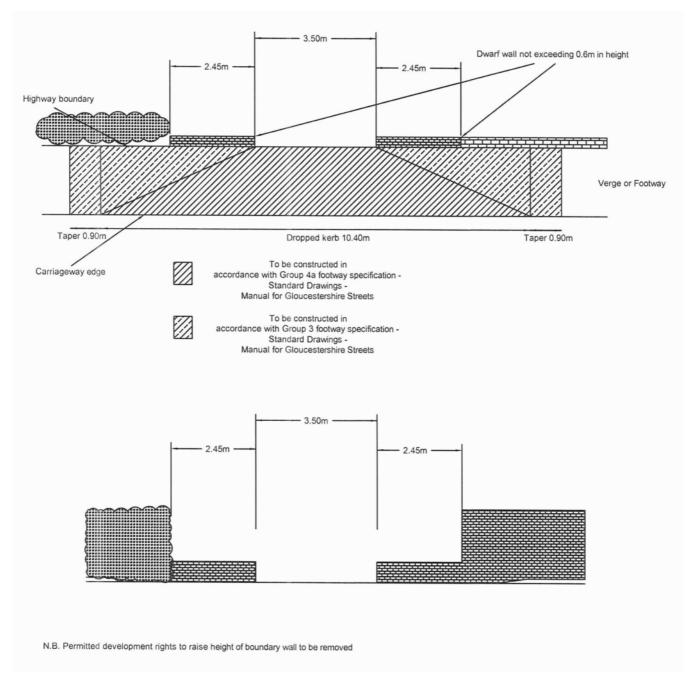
Alternative access to 1 dwelling on constrained site where gate post positions cannot be set back 5.0m.
